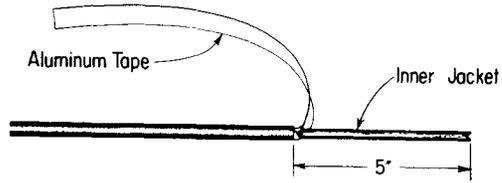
Strip Outer Jacket and Aluminum Tape
